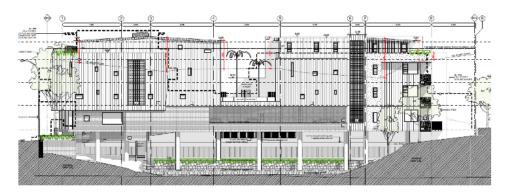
Elevation showing building height breaching elements when the 11 metre height standard is projected above the FPL
